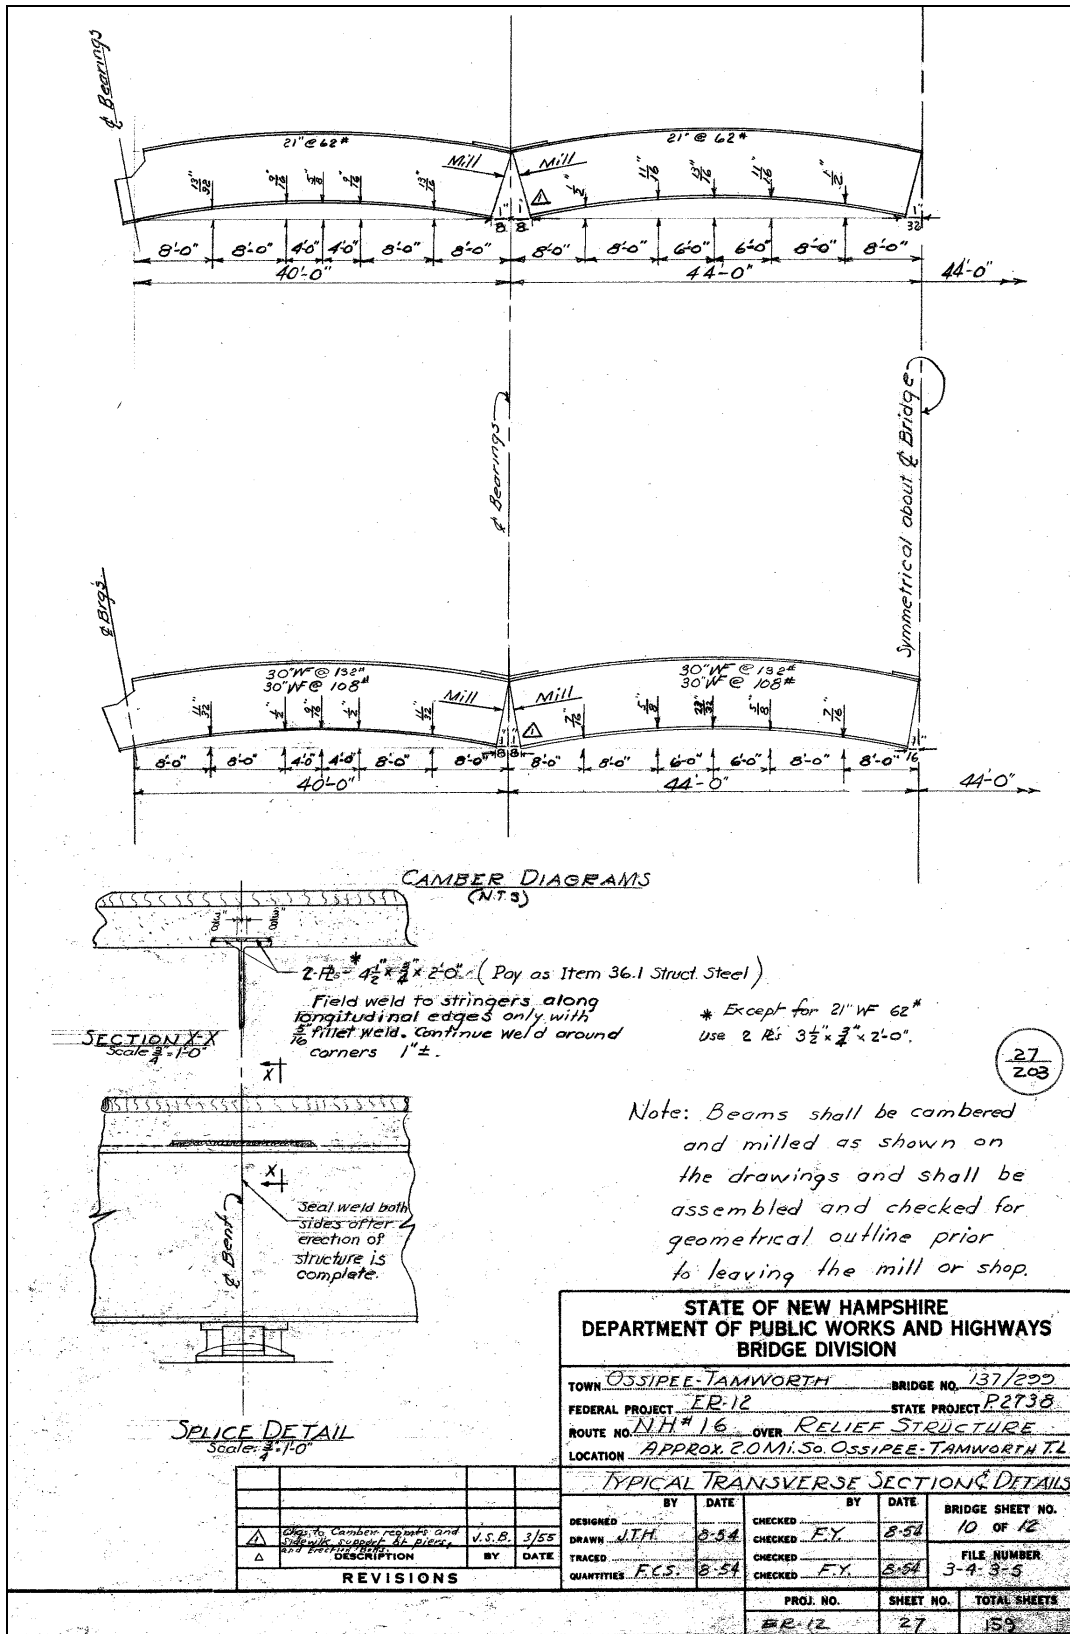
Stringer camber and splice details, part of the design that makes the stringers function structurally as both simple and continuous beams (From Sheet 10 of original drawings, NHDOT File No. 3-4-3-5).
